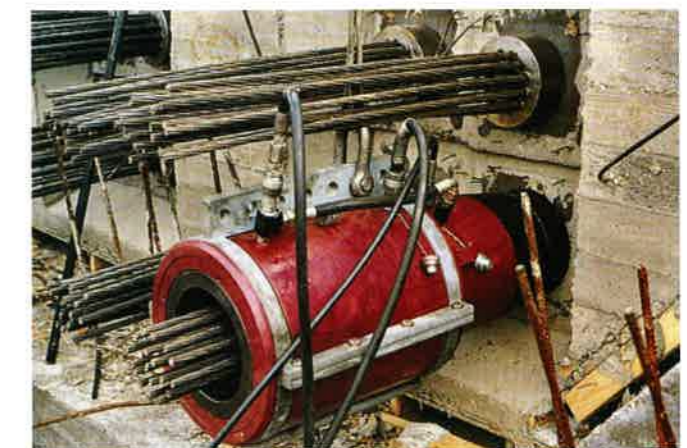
B-1 Example of a Multi-Strand Stressing Jack Held in Position by a Crane (P160)
